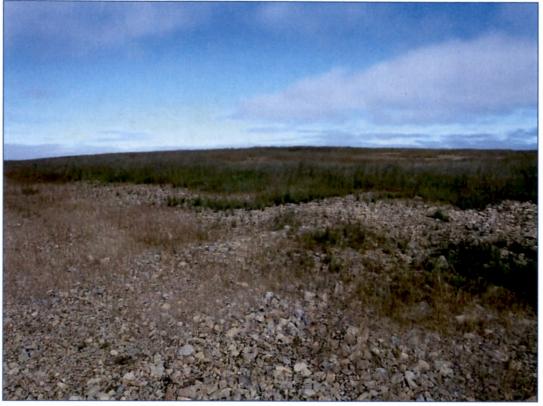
Site 7 Landfill – View of top of landfill from south end, facing north.
